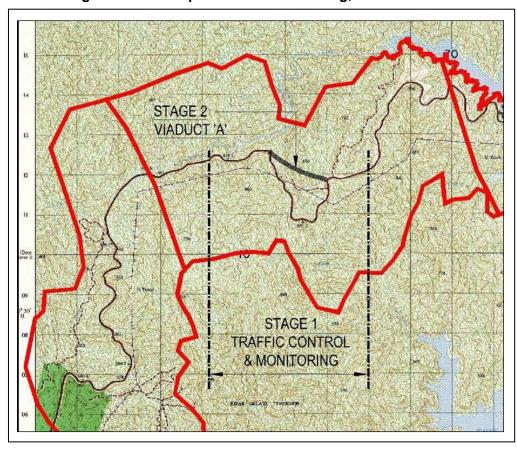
Proposed Wildlife Crossing, PL-2 Site A
